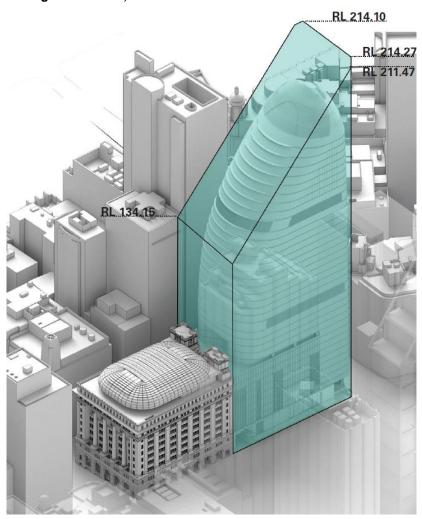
Proposed detailed design fitting loosely within the approved building envelope Source: JPW
